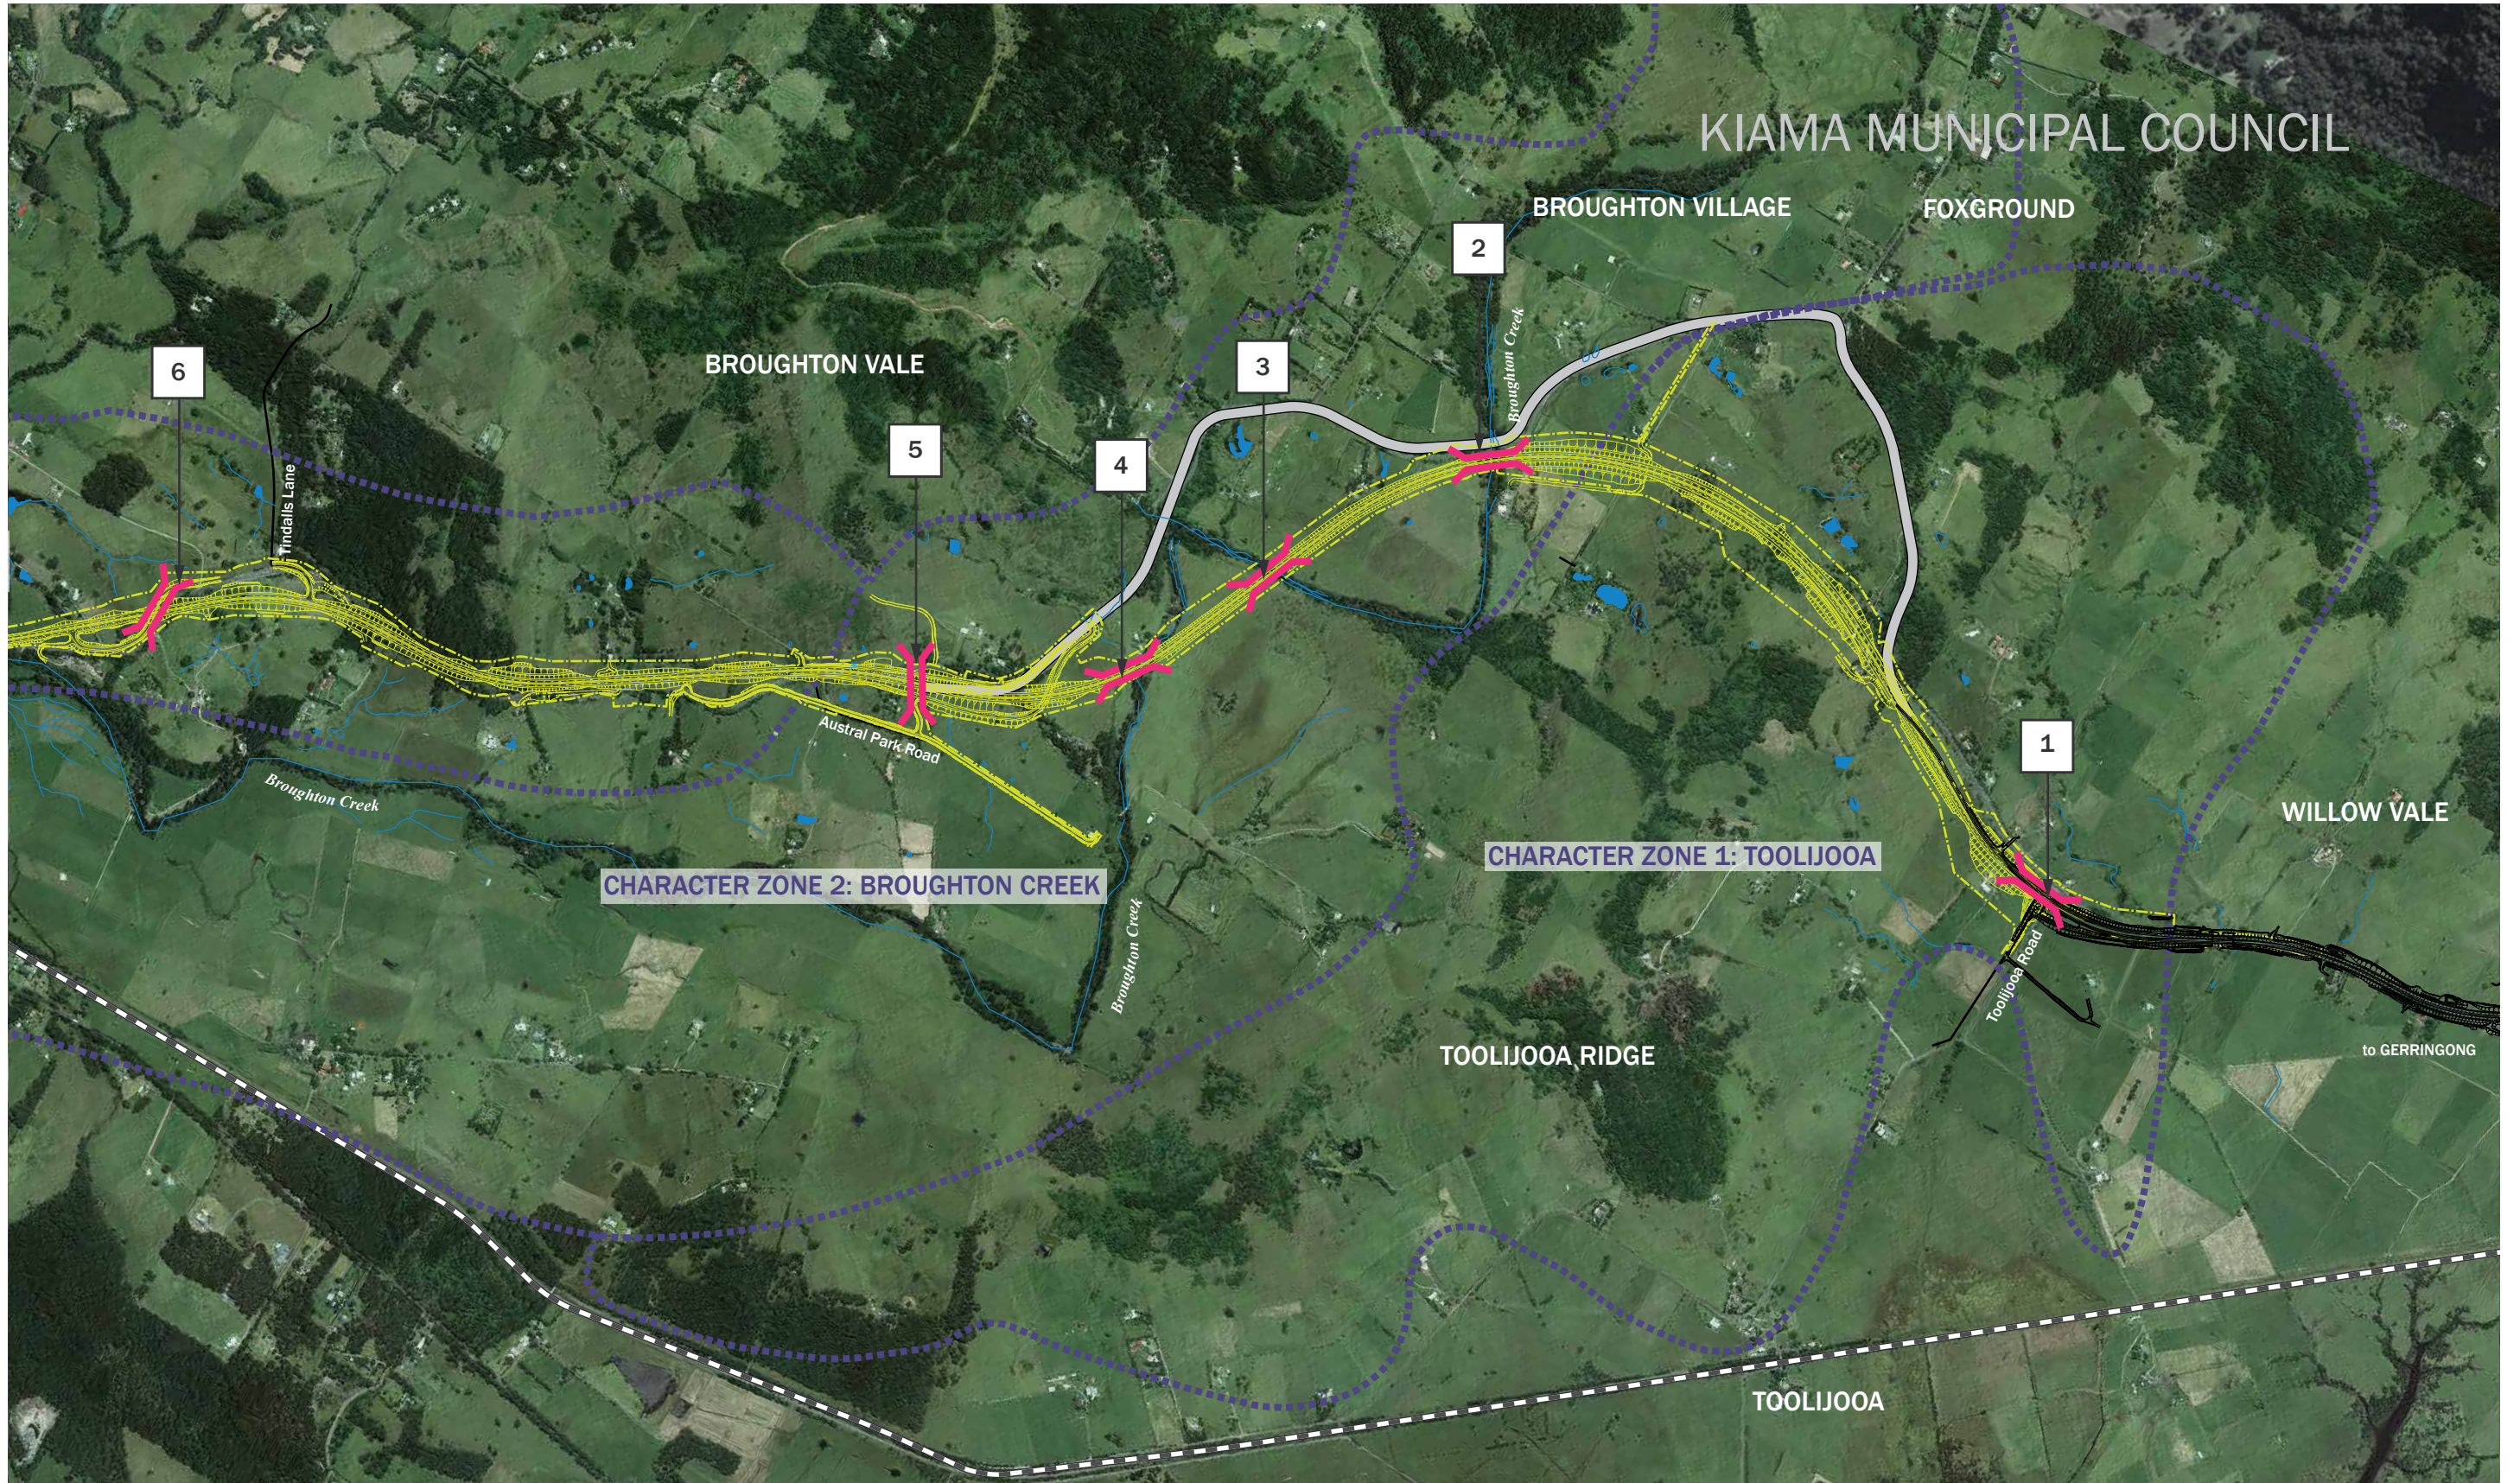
Key plan – Bridges, Noise Barriers, Headlight Screens and Retaining Walls
